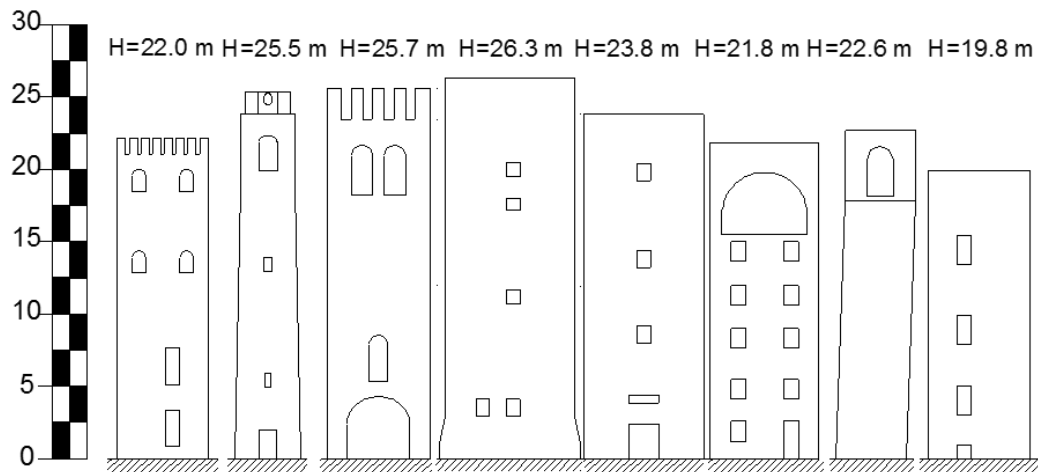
Schematic elevation views of the towers under study and indication of the height.
